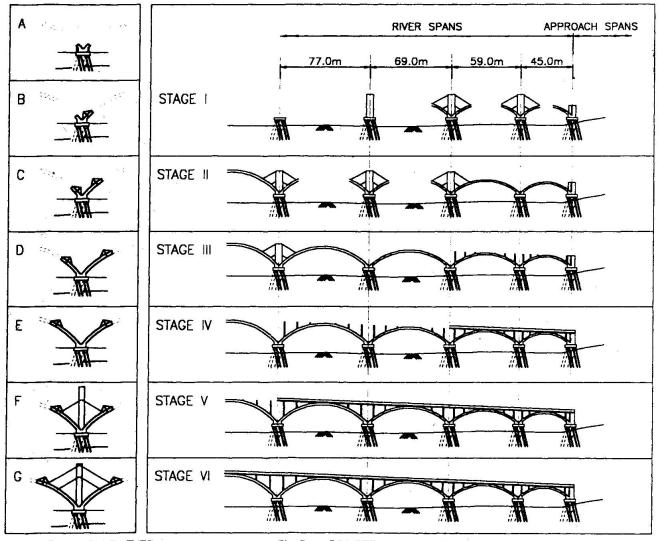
TYPICAL CANTILEVER CONSTRUCTION SEQUENCE FOR ARCH USING STAY
